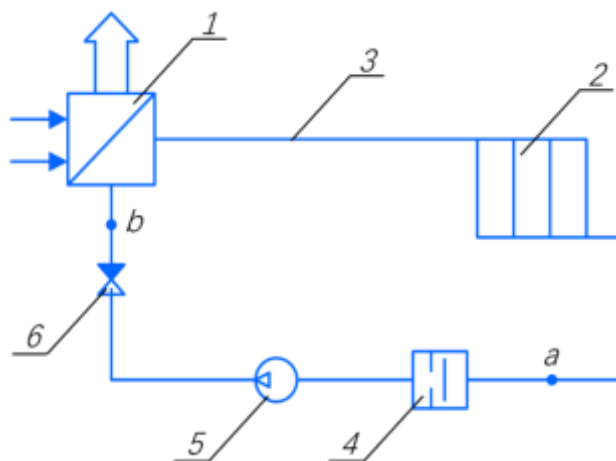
Laboratory circuit with a warm baseboard in pulse mode: 1 – boiler; 2 – heating device; 3 – pipeline; 4 – shock valve; 5 – pump; 6 – check valve
